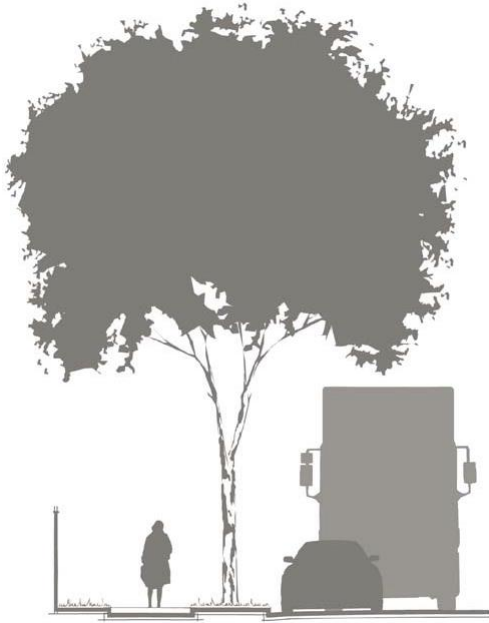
Small street tree with wide crown form showing obstruction of footpath and road carriageway and unsightly clearance pruning required.
